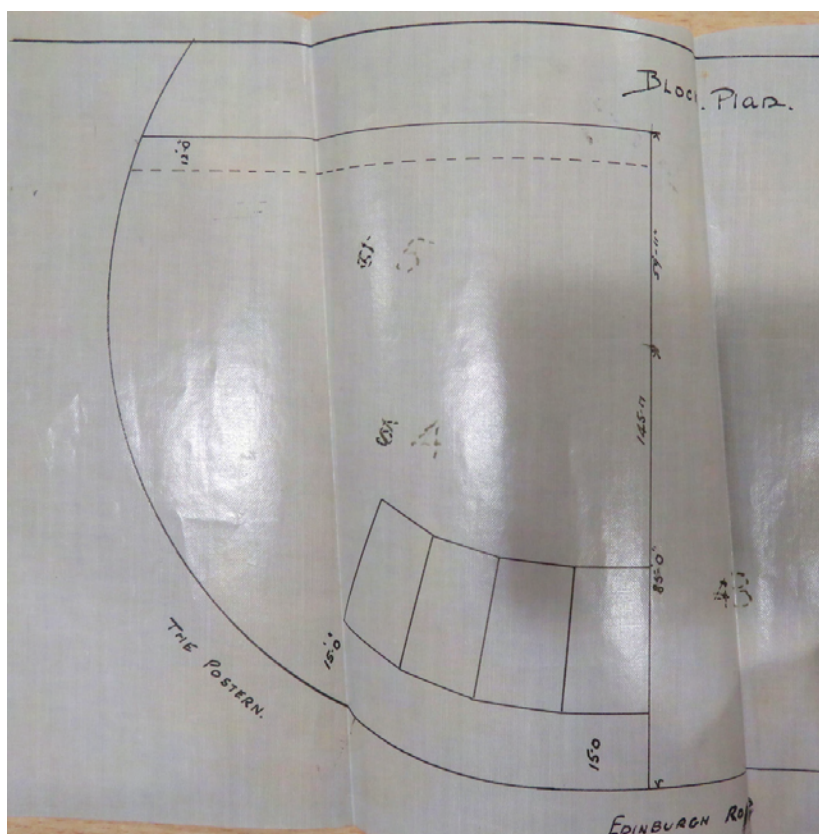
D BA 1924/640 Application by S.A. Spargo to erect four shops on the corner of Edinburgh Road & The Postern: Block Plan
